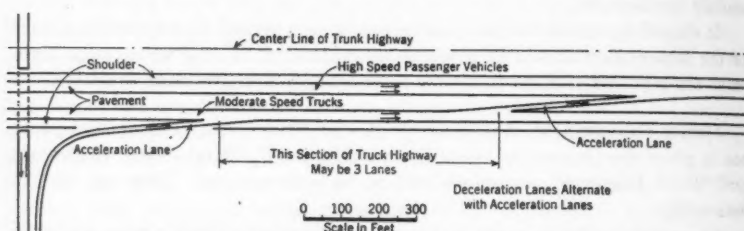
ACCESS PLAN FOR A FOUR-PAVEMENT TRUNK HIGHWAY. ONE QUADRANT IS SHOWN; OTHER QUADRANTS ARE SIMILAR.
